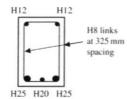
Cross-section of beam in Examples 3.3 and 3.4
